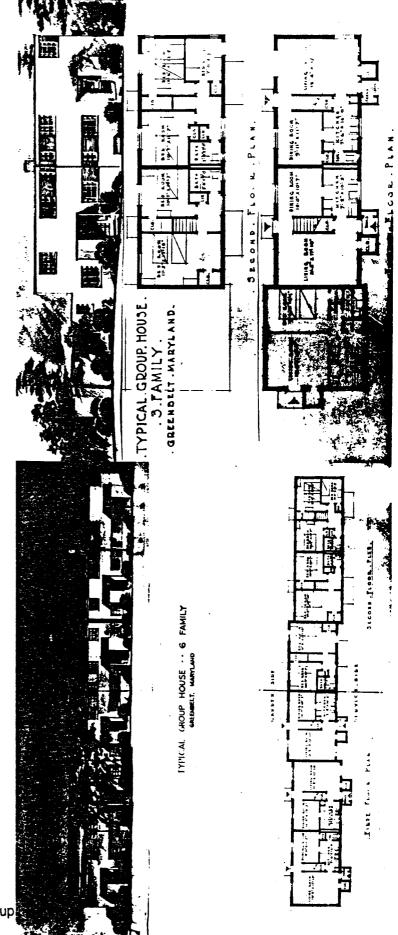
"Greenbelt" Typical Group Houses, Elevations and Plans
